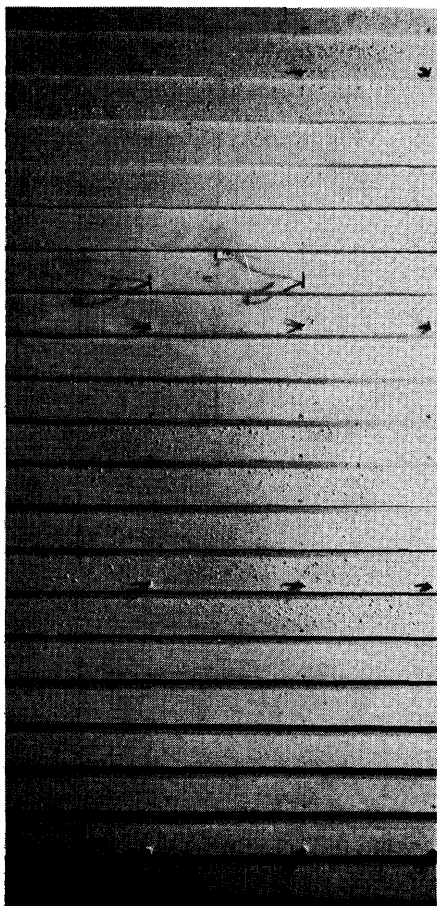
Extent of Blistering on Wall 1B (No Insulation, $\frac{1}{8}$ -Inch Furring) after Test
